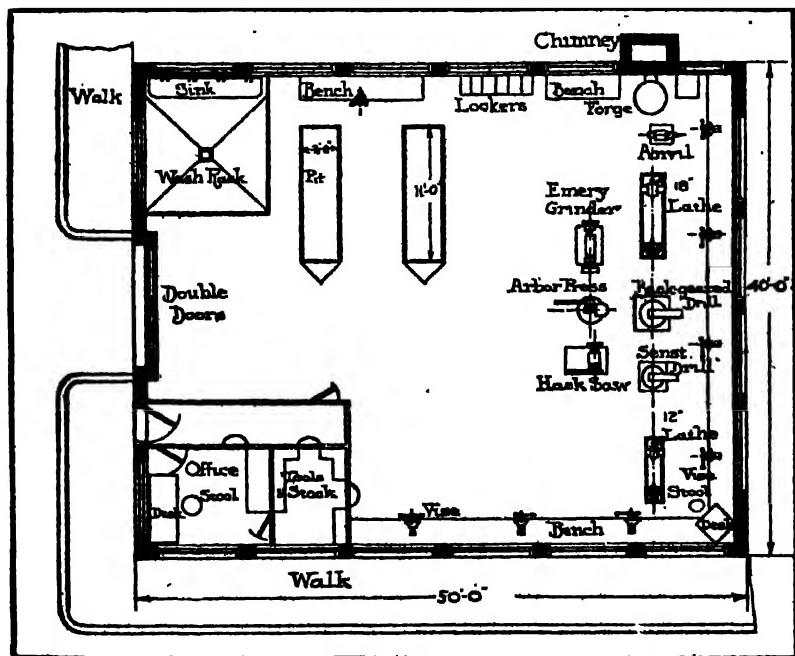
Floor Plan of Small Repair Shop, Showing Location of Pit and Machinery.
